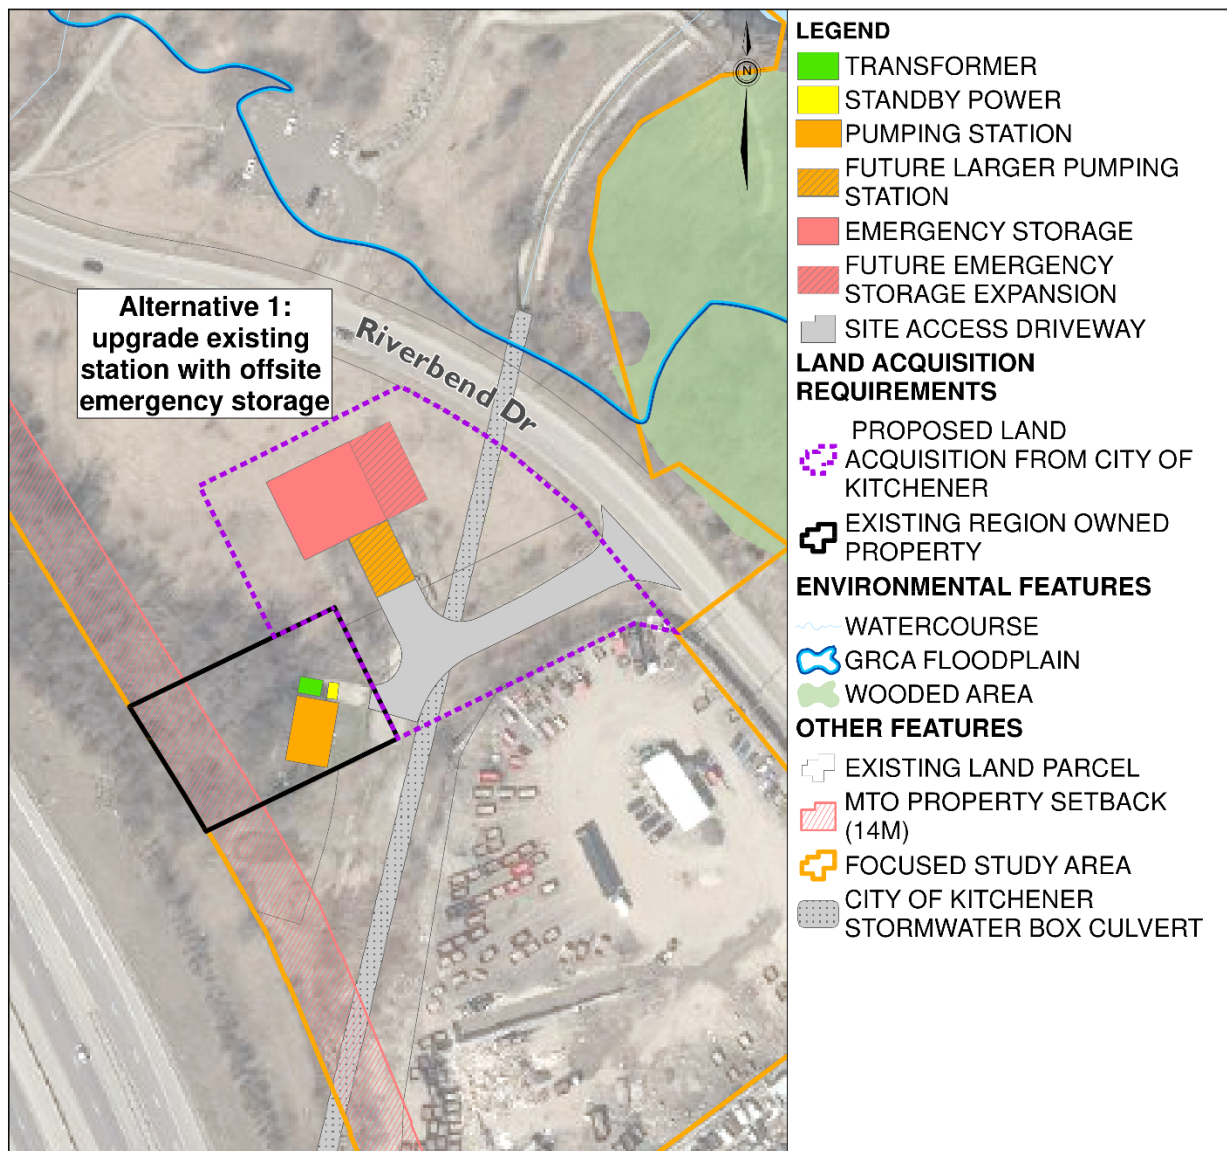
Alternative 1 - Upgrade Existing Station with Offsite Emergency Storage
